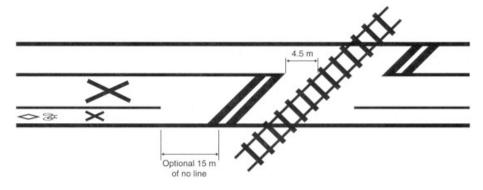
Skewed Railroad Crossing Unrestricted Right-of-Way Width
